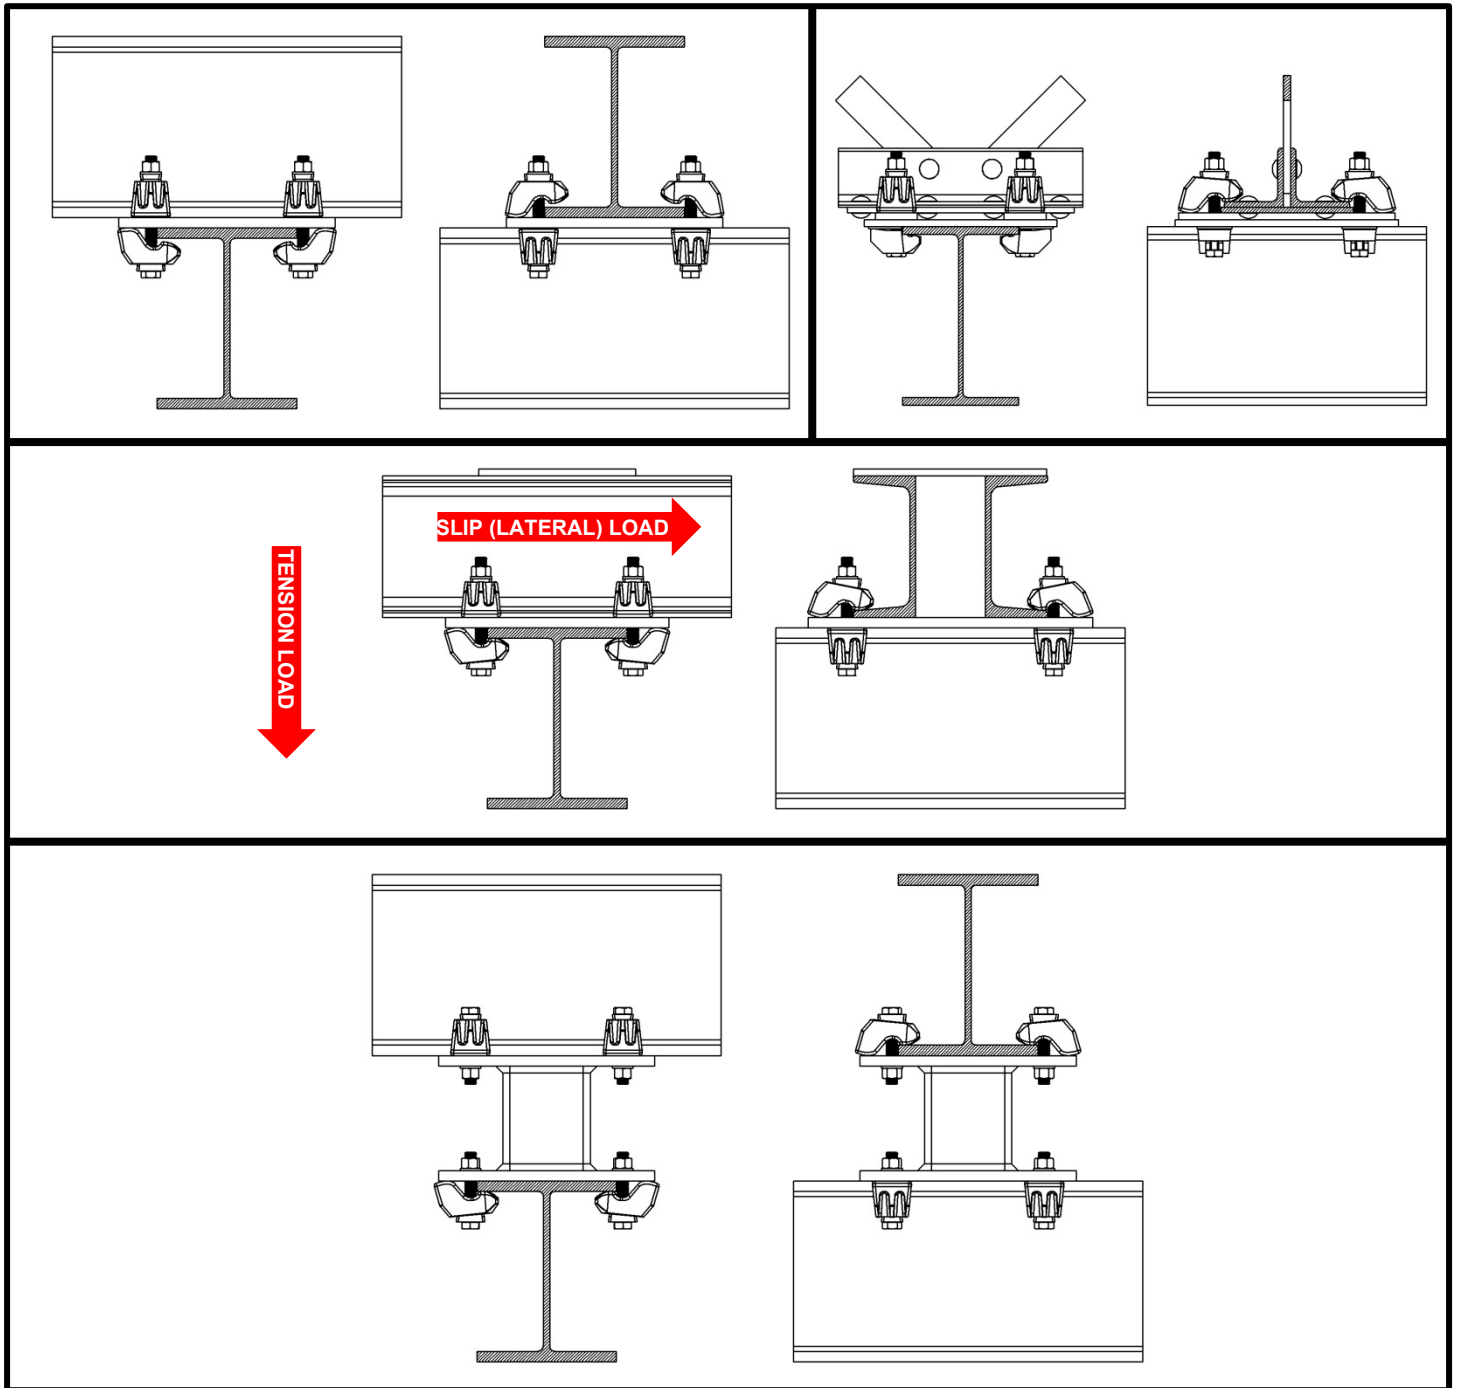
TYPICAL GIRDER CLAMP CONNECTIONS
